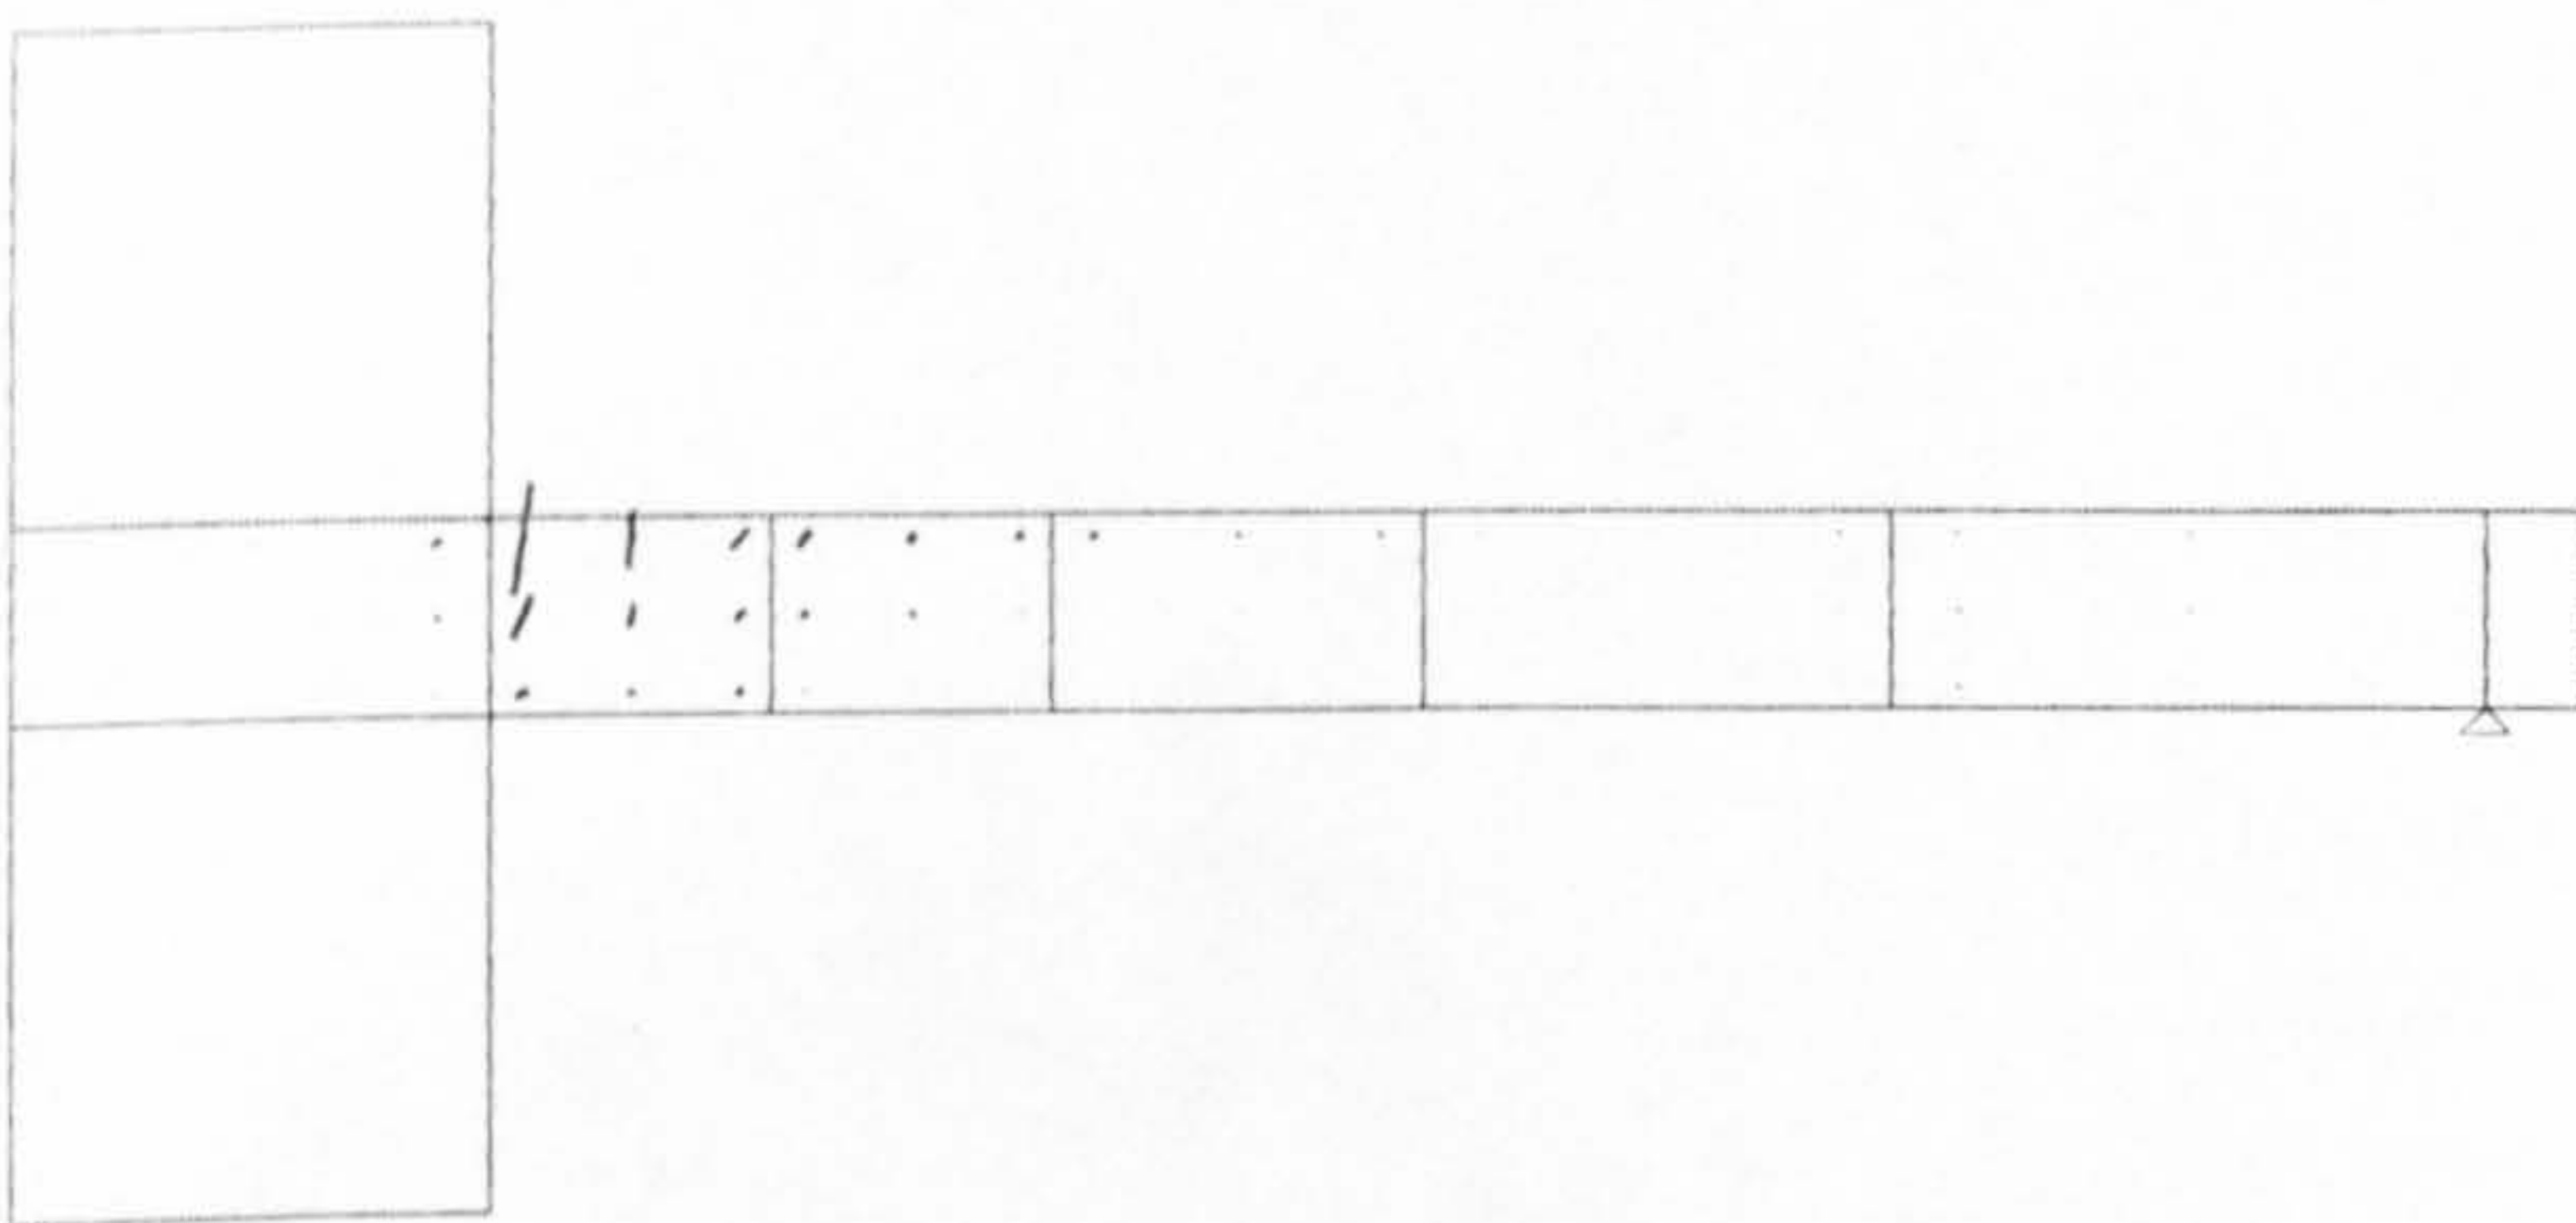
Crack pattern for slab JS2 (flexural failure)
